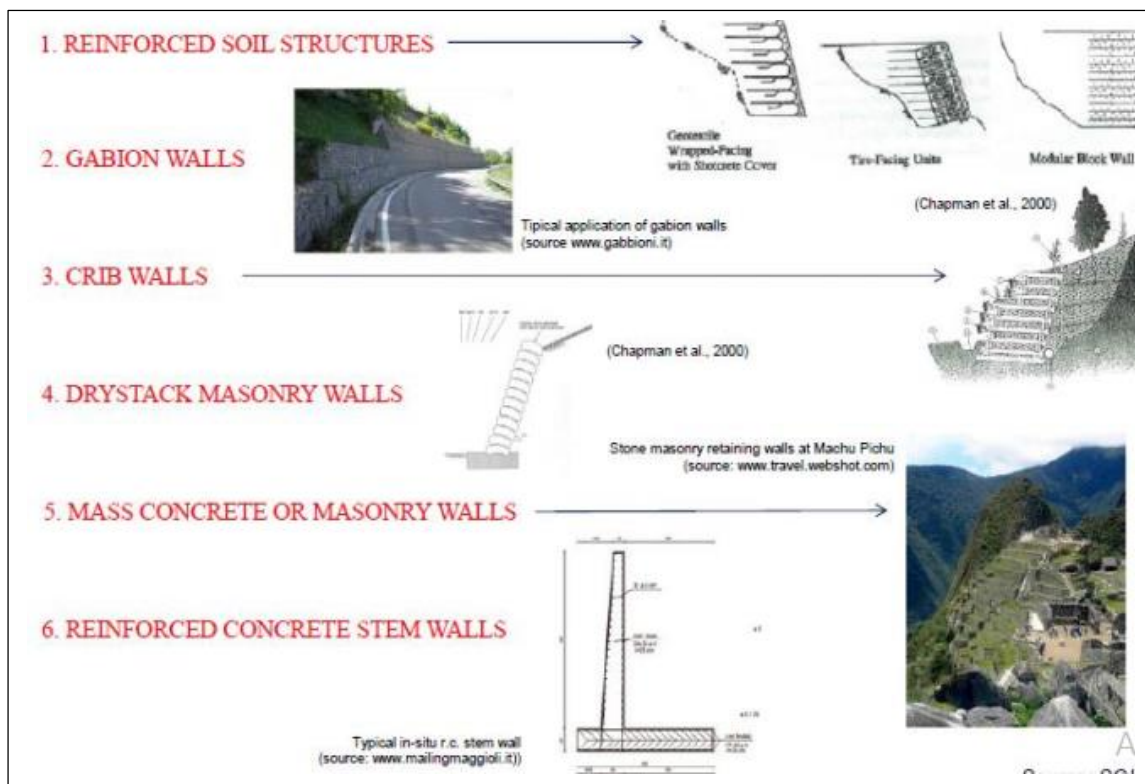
Rigid retaining walls on landslide (B. Schrefler and P. Delage, 2010).
